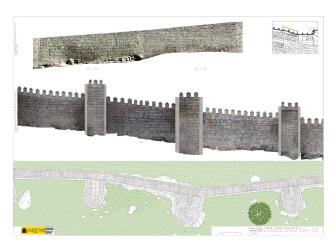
Example of one of the plans: floor plan, orthophoto of the exterior side (University of Avila) and orthophoto of the interior side.
